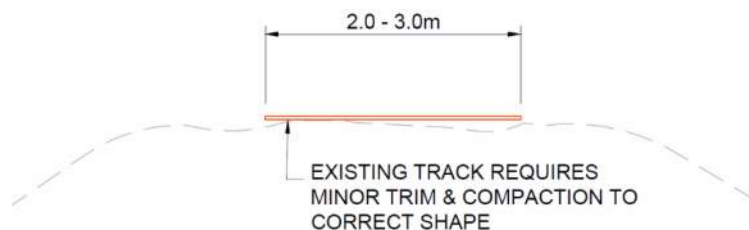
Typical cross-sections for compacted sand or clay ('Type T' pavement)
